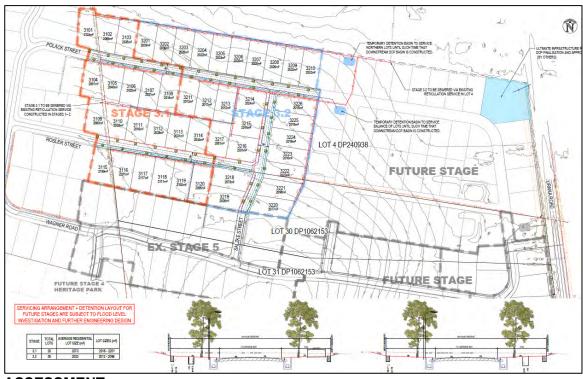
Proposed s taging plan and a cross section of the proposed roads
